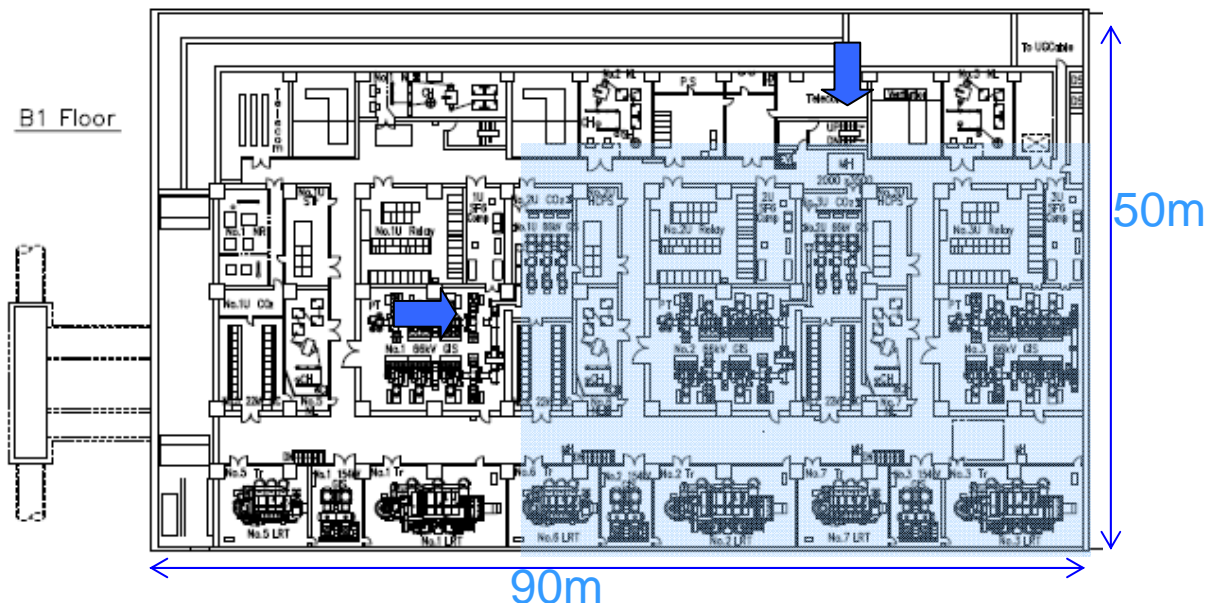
2-Floor Type Underground Substation Layout, and Design Review for More Compact Design.
